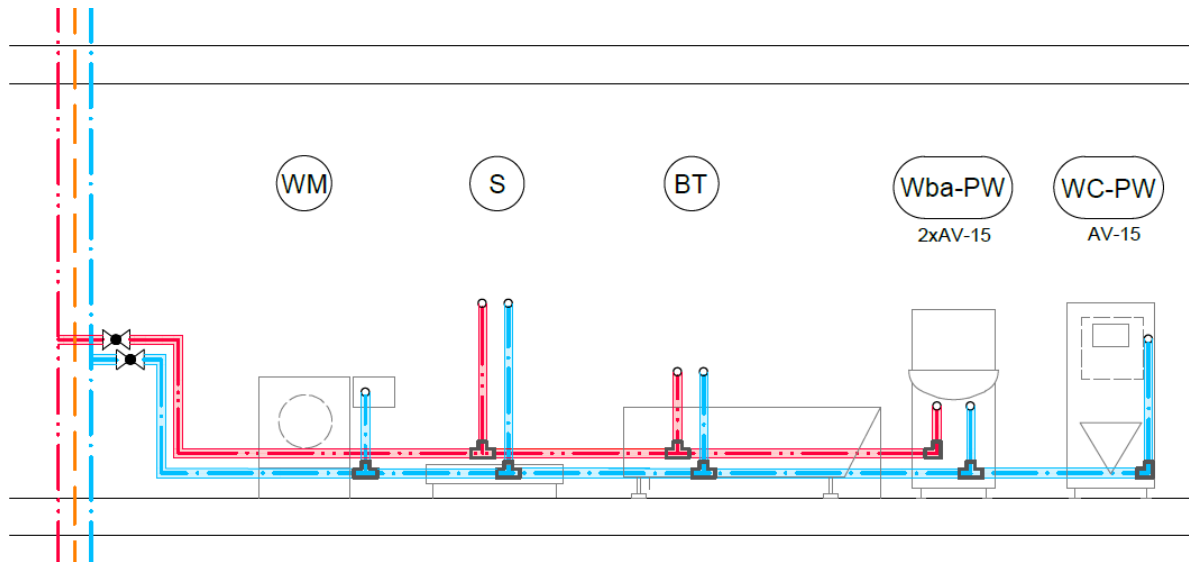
Trunk and branch system with a connection of valves using T-pieces fittings
